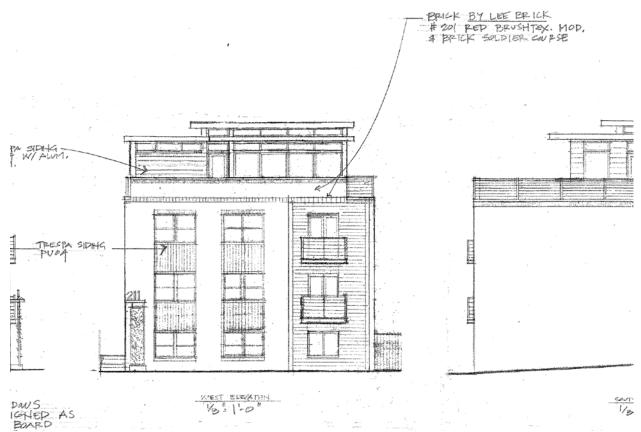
West elevation showing existing pilasters on the southernmost bay and the infill with Trespa Pura siding panels that will also be used on the fourth-floor addition and vertically beneath the third- and second-story windows. Image also shows proposed brick belt course capping the area encompassed by the pilasters.
